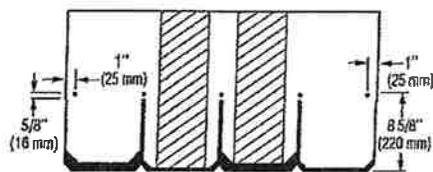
Use five nails for every full Grand Manor Shingle, Carriage House Shingle, or Centennial Slate.
